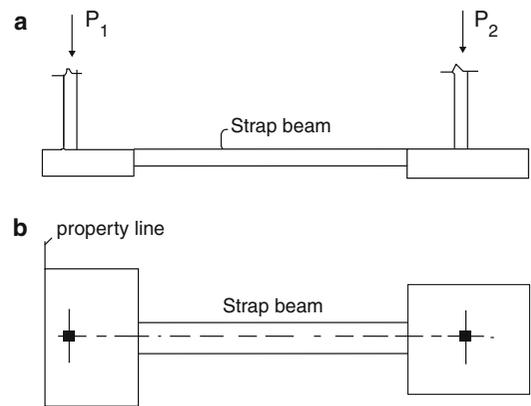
Strap footing layout. (a) Elevation. (b) Plan view
